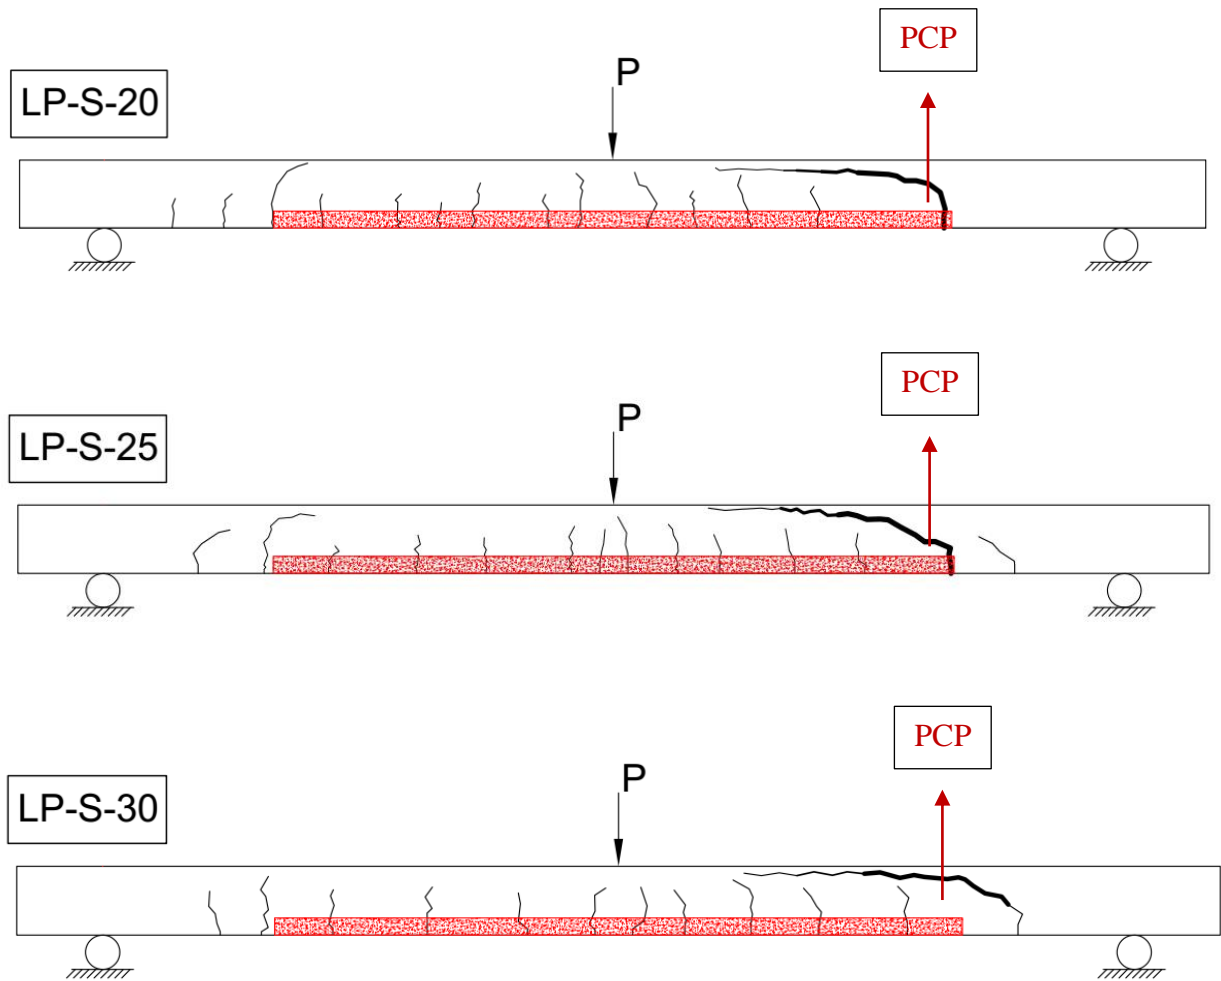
Cracking Patterns of Tested Slabs at Failure
